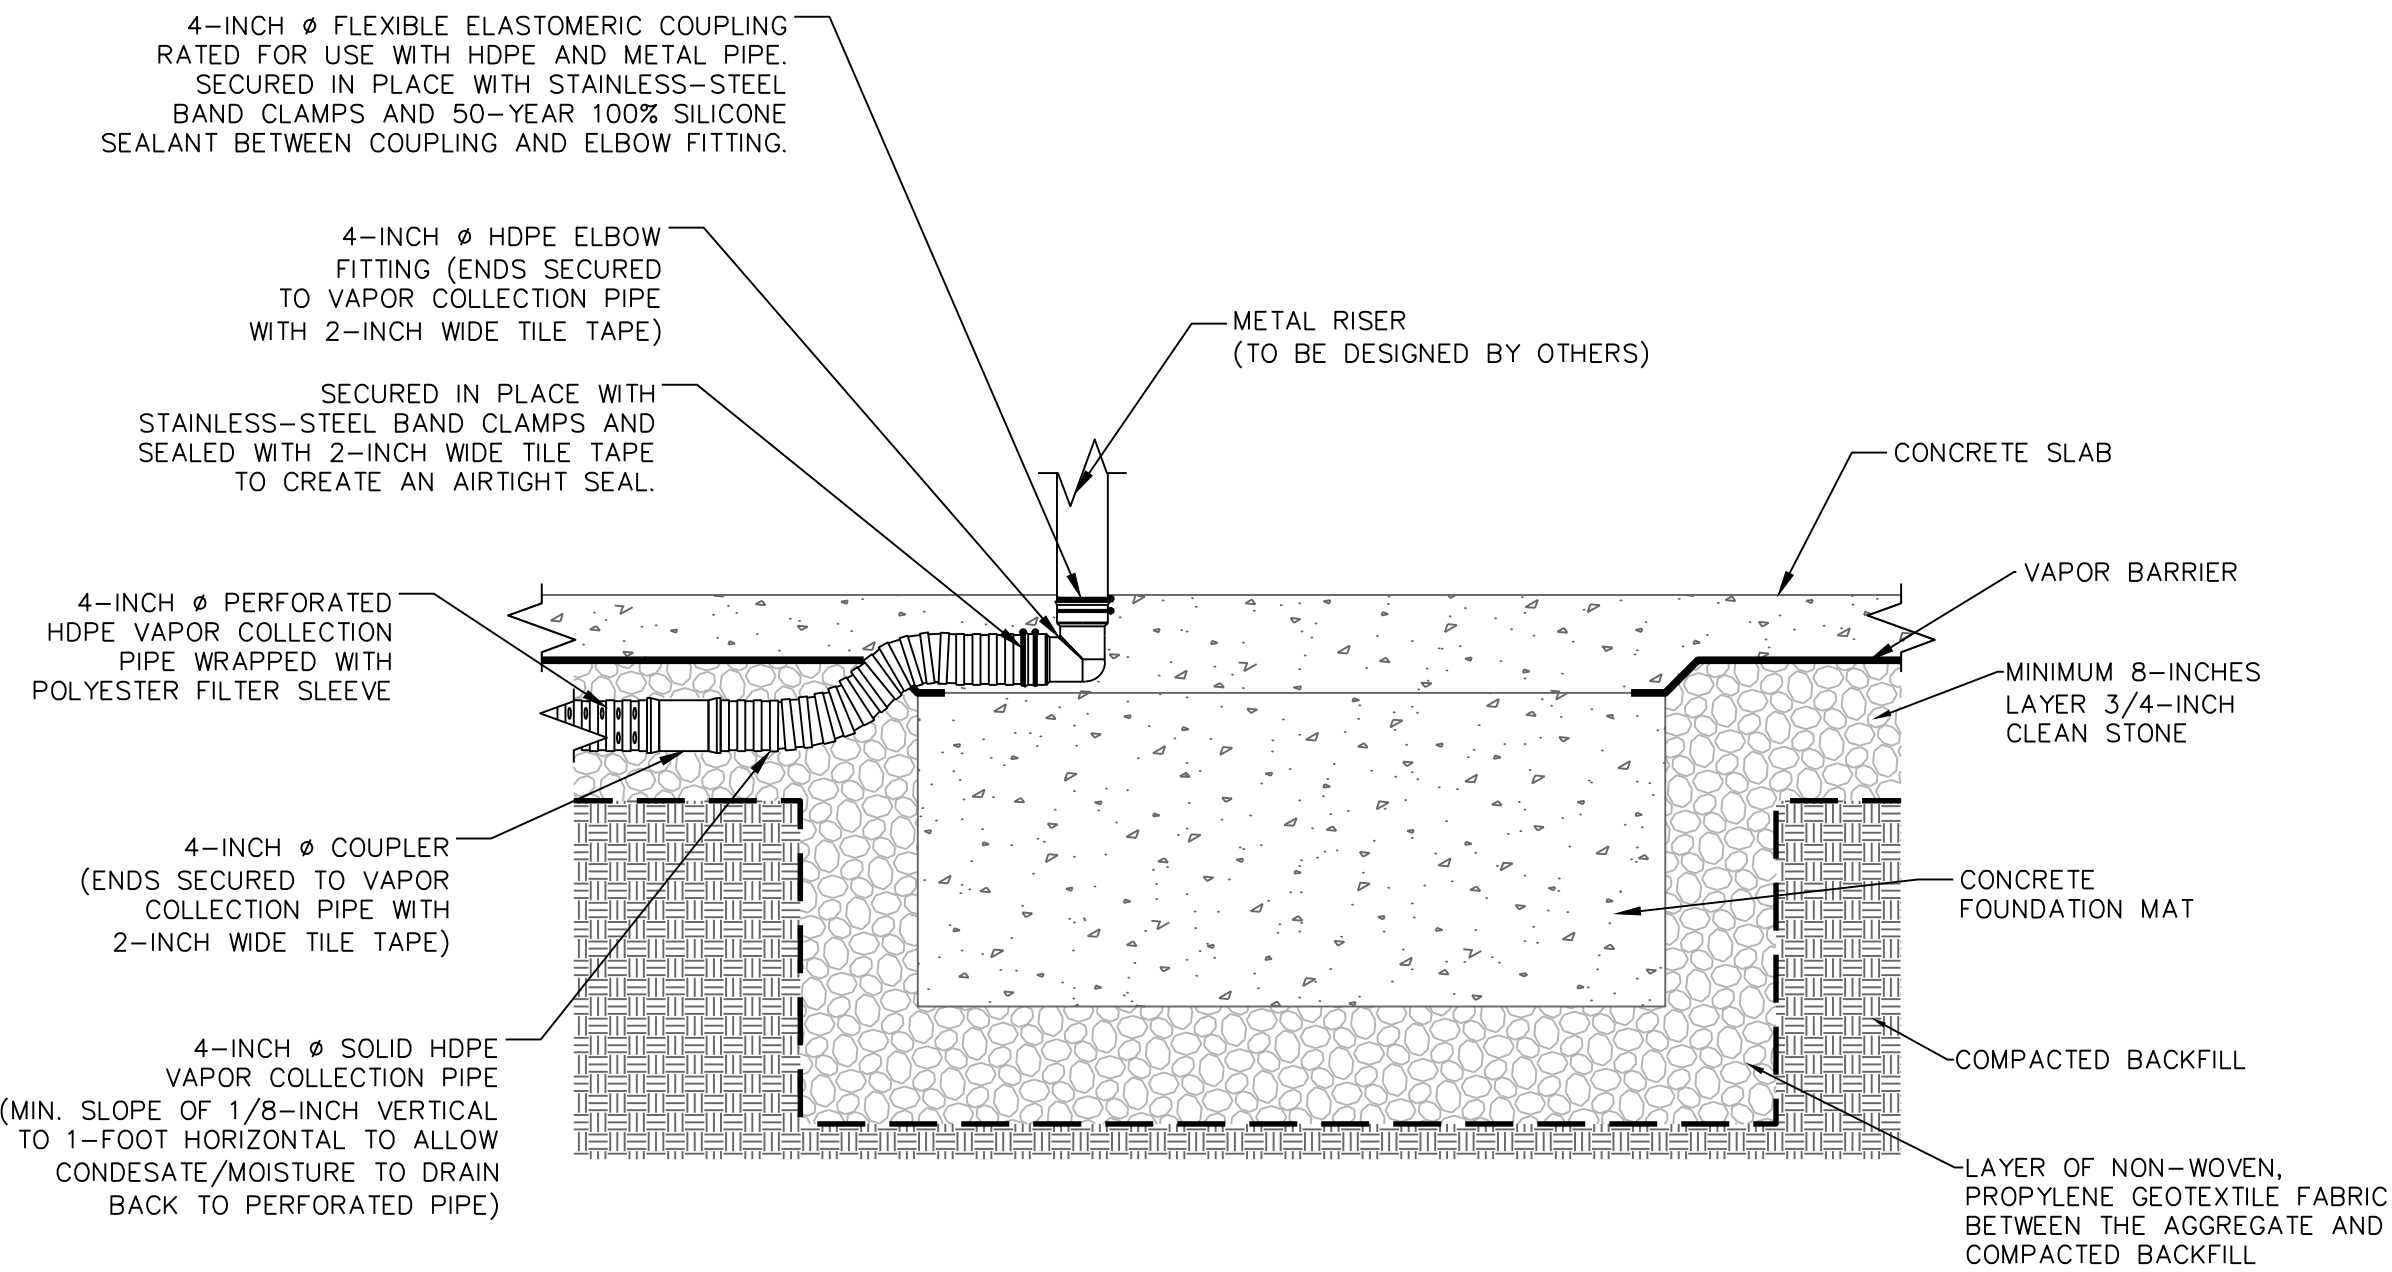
TYPICAL SECTION AT SOLID RISER PIPE
